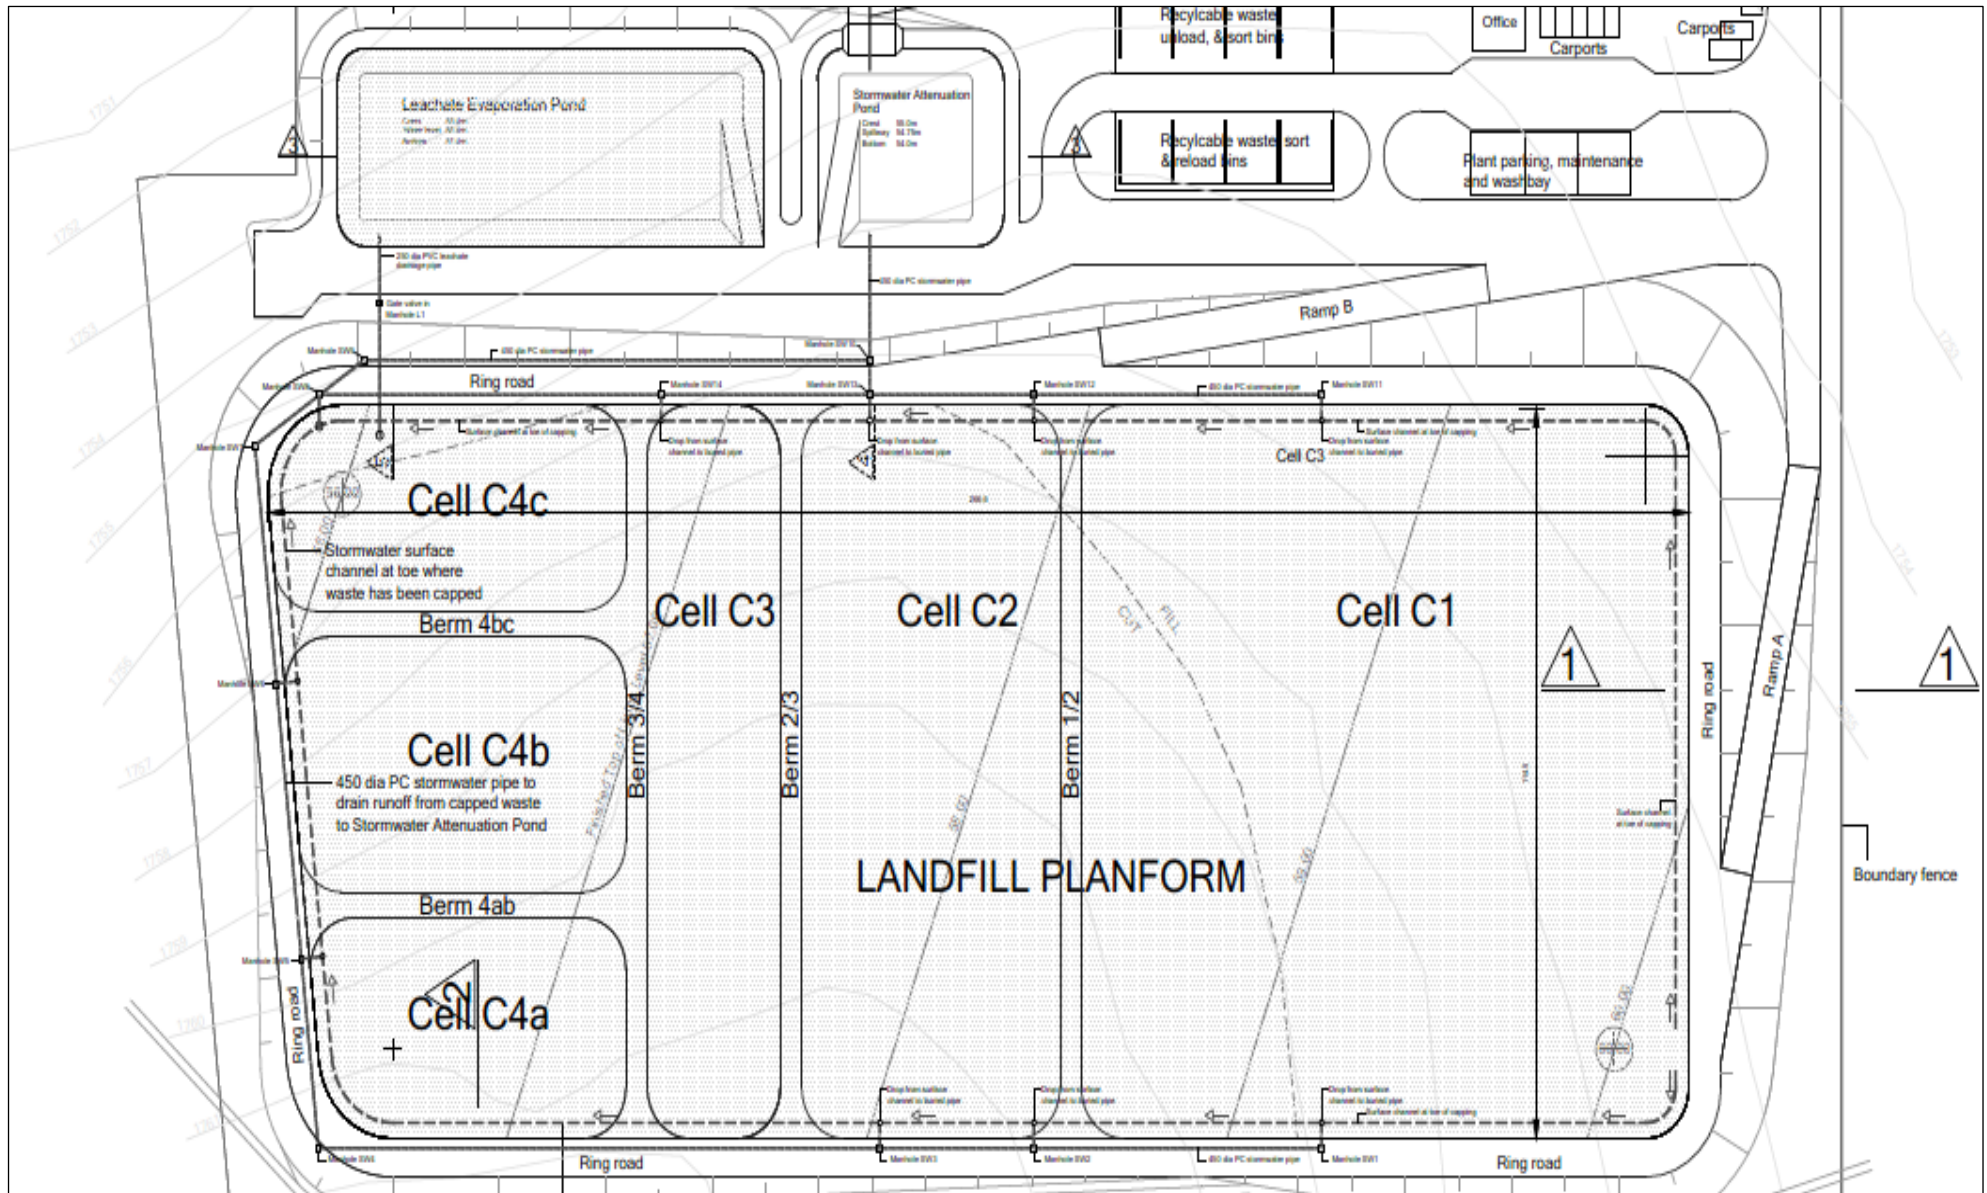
Layout considered for the new general waste disposal site at the Eskom Majuba Power Station
